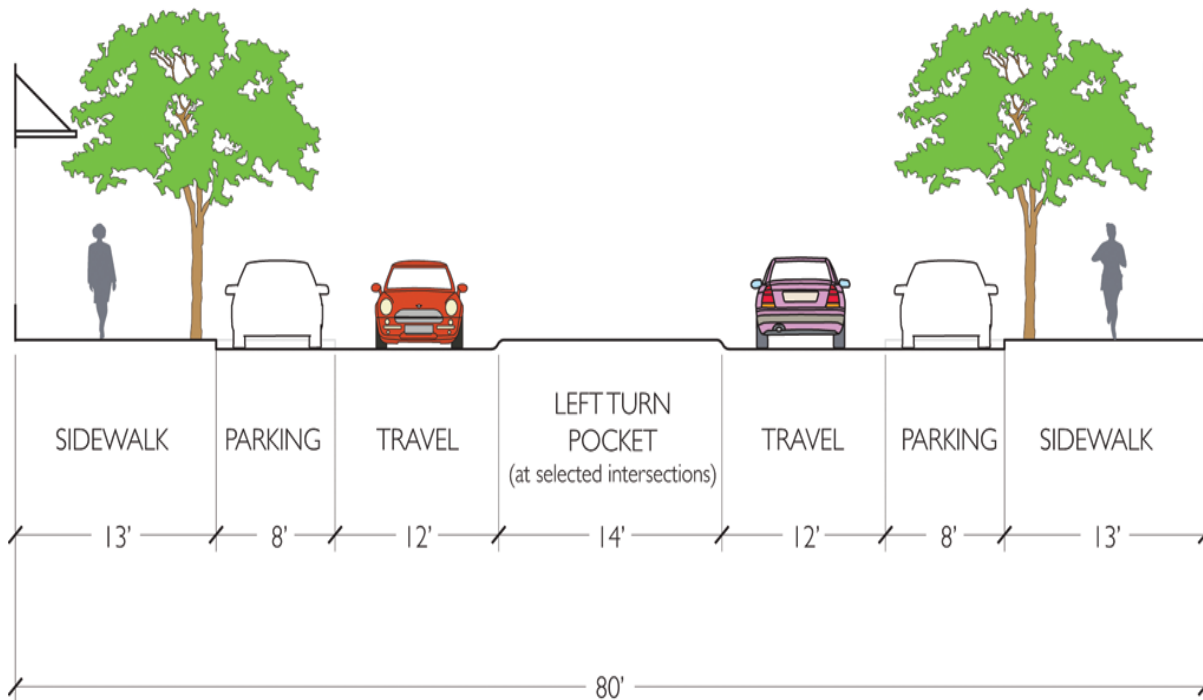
Conceptual Design - West Broadway Avenue Cross Section-Median
